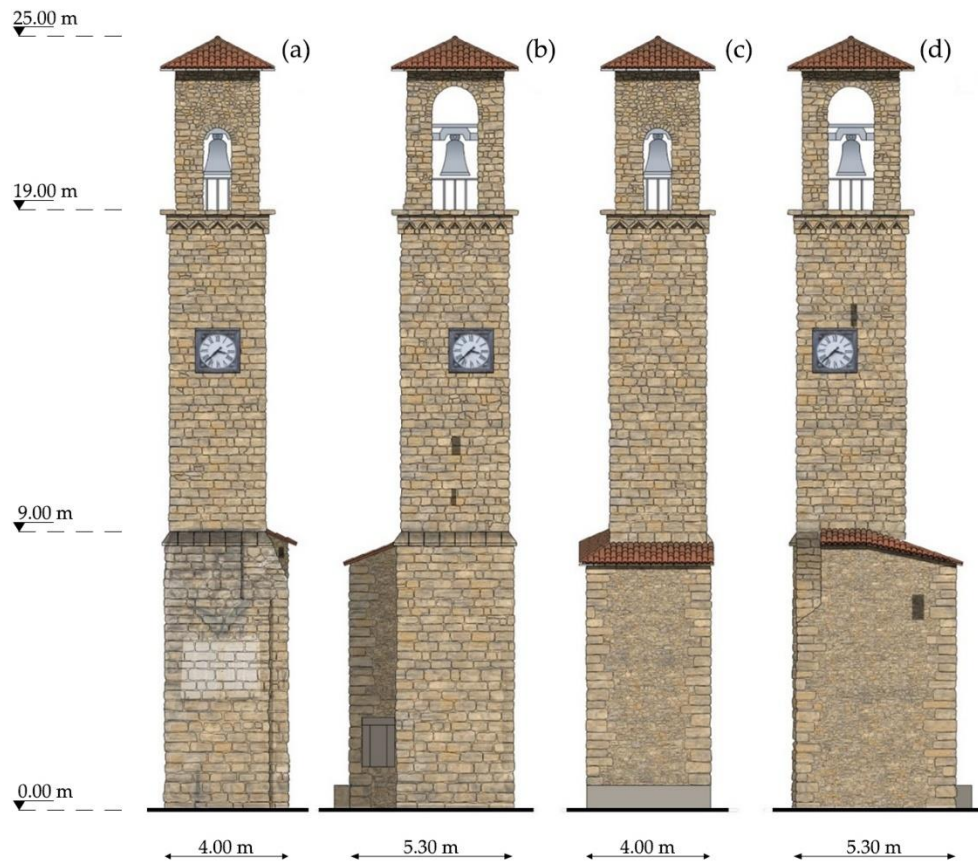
Drawing of the North façade (a), East façade (b), South façade (c) and West façade (d)
